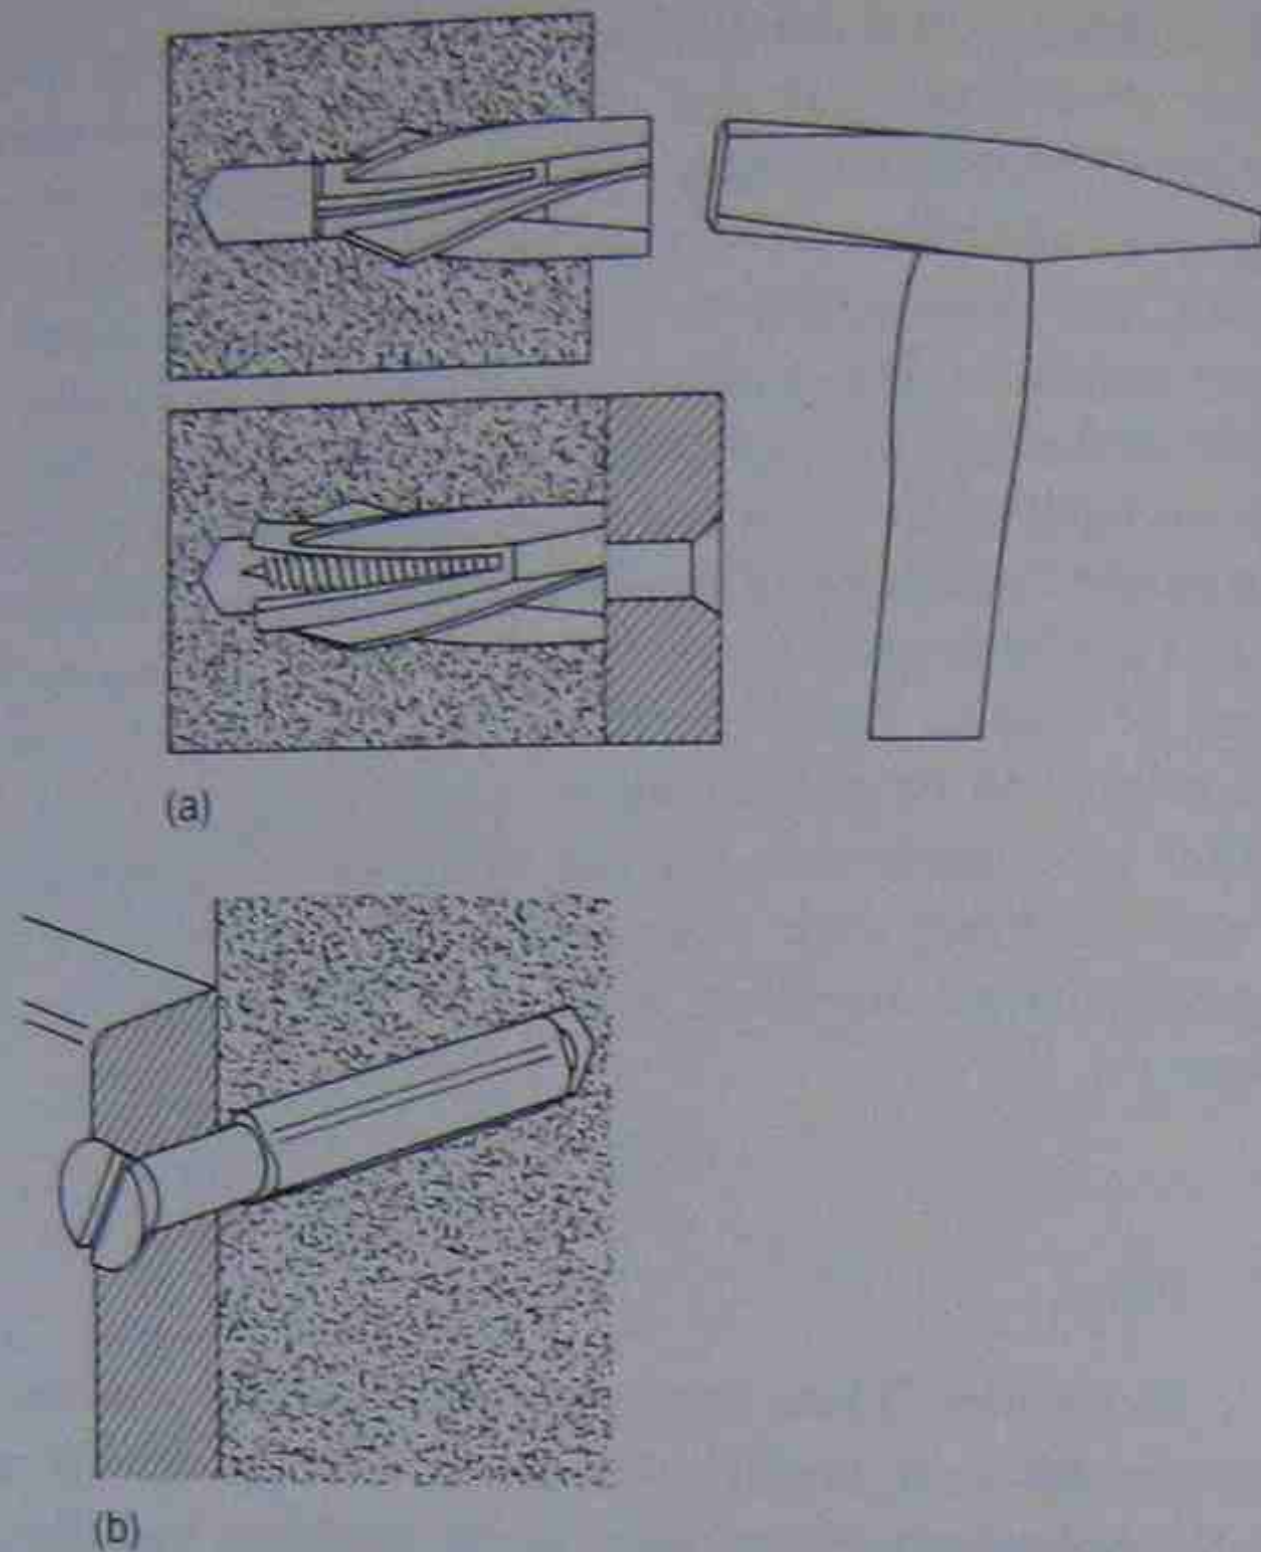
(a) Fischer Twist Lock anchor (b) Rawlplug Hammer Screw
